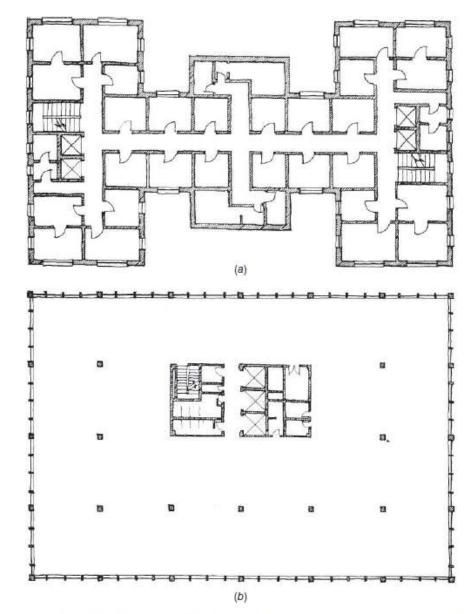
In contrast to office building plan (a), which provides daylight and natural ventilation in each office, office building plan (b) receives mechanically cooled and filtered air, is less subject to exterior noise, typically provides constant light and temperature throughout, and provides for more rentable floor space on its site. Plan b also allows less daylight to reach the street level, consumes much more electricity (though probably less heating fuel), and thus contributes more waste heat (and possibly noise from mechanical equipment) to its surroundings year-round.
